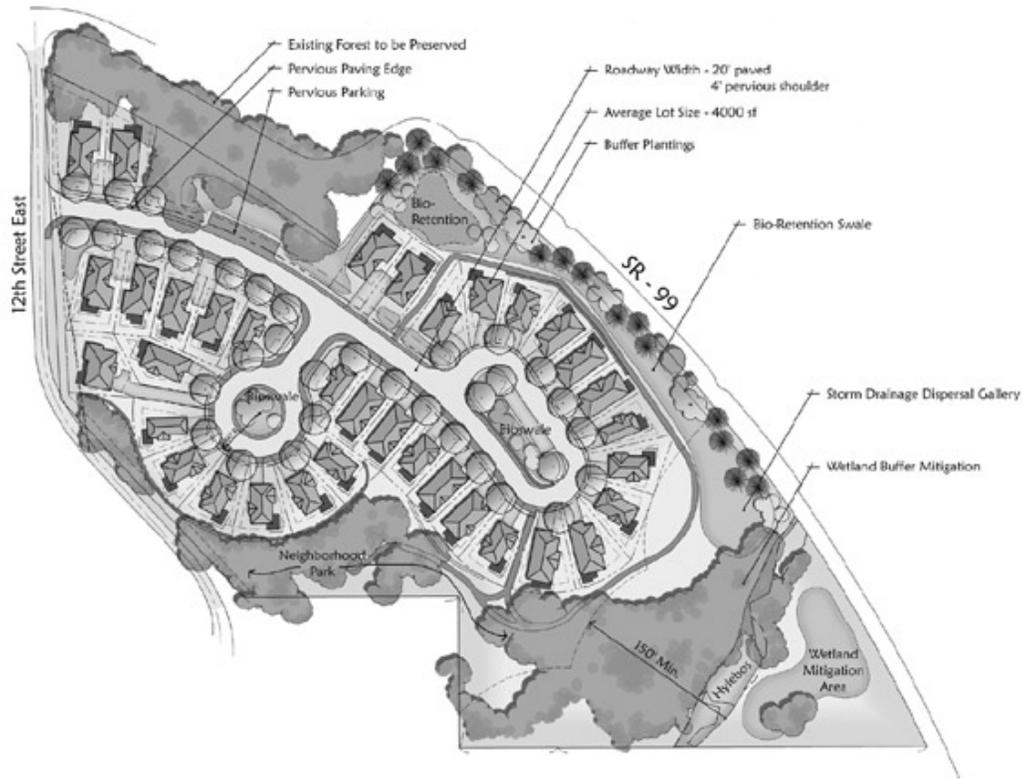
Meadow on the Hylebos site plan: Source. PSP
